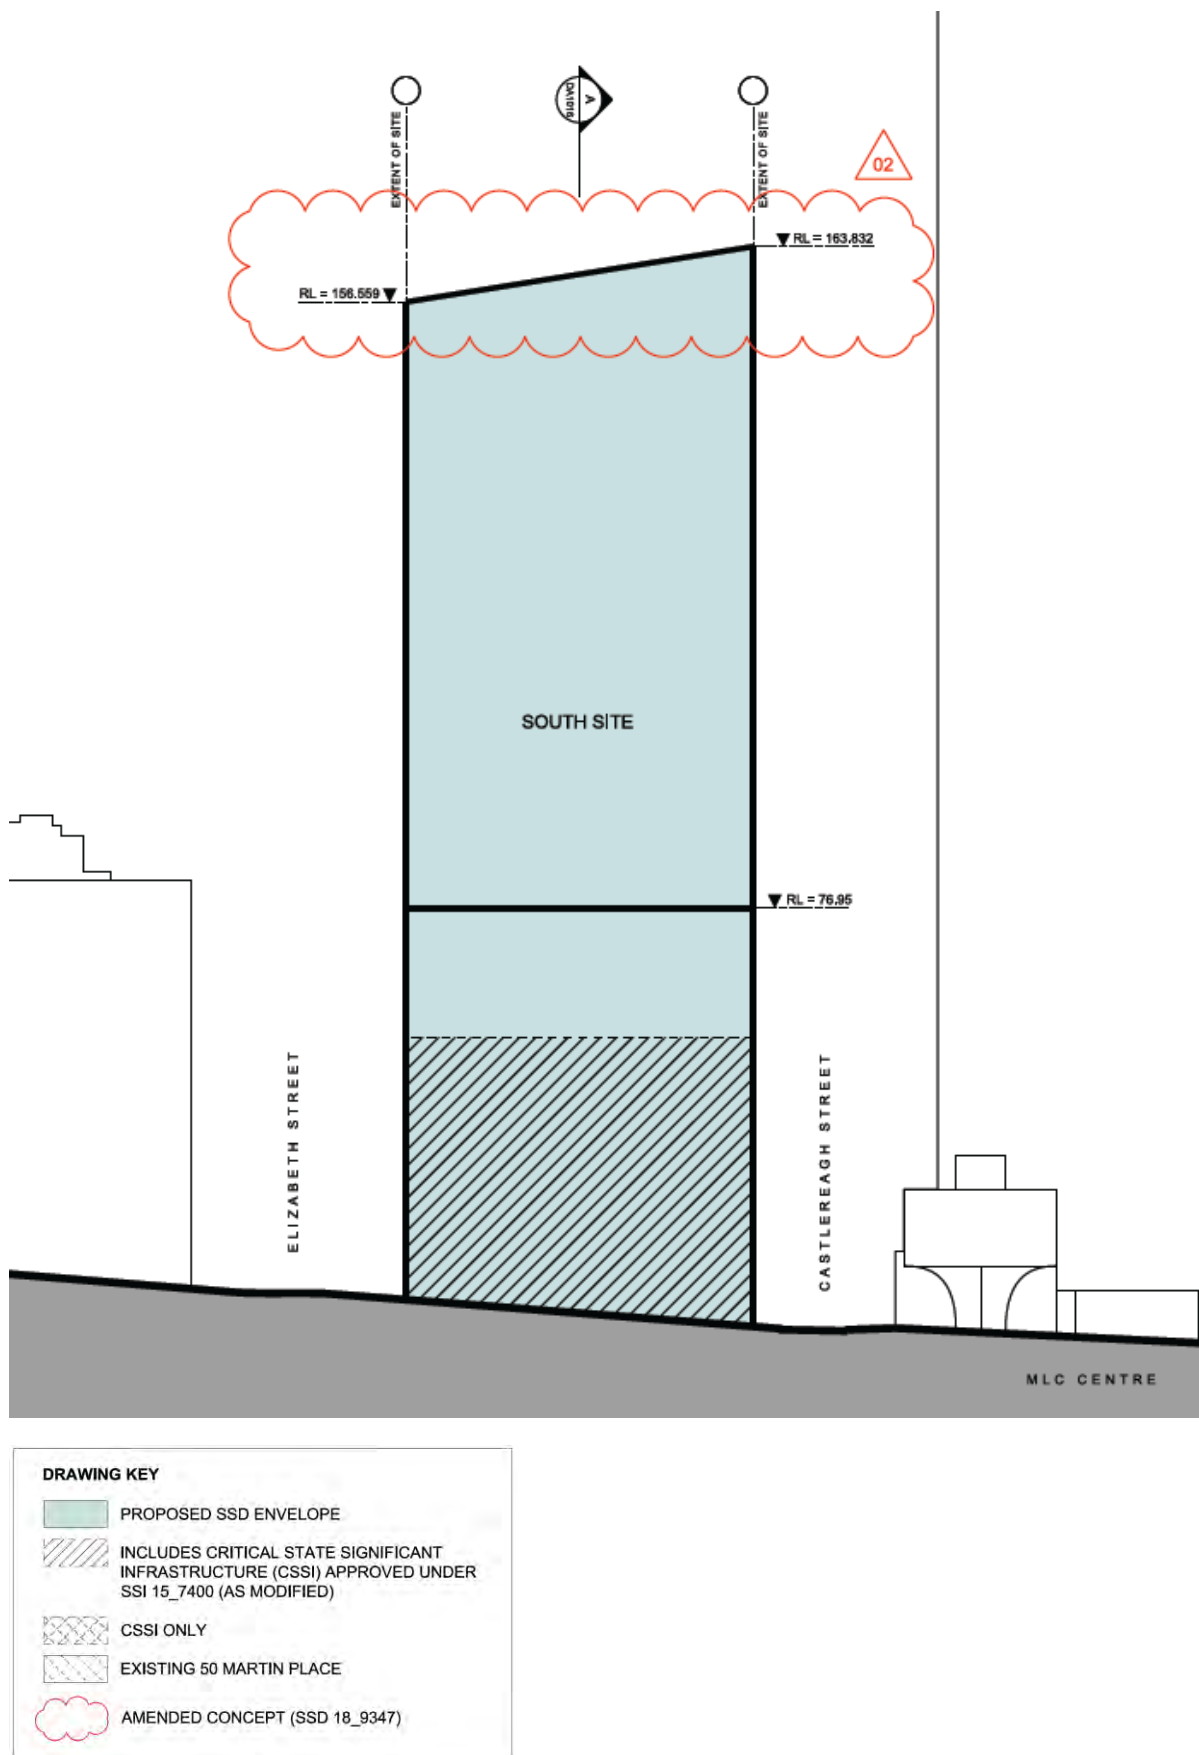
Proposed South OSD tower building envelope, north elevation (Martin Place) (amendment clouded red)
